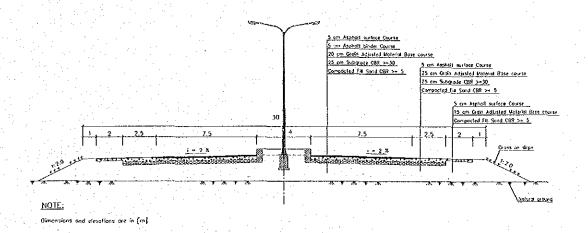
Typical Cross Section of Access Road to Thi Vai Site
